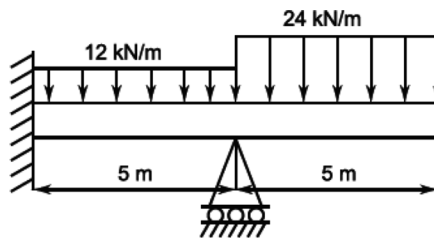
Propped cantilever beam with stepped loading for Example 5.8.
